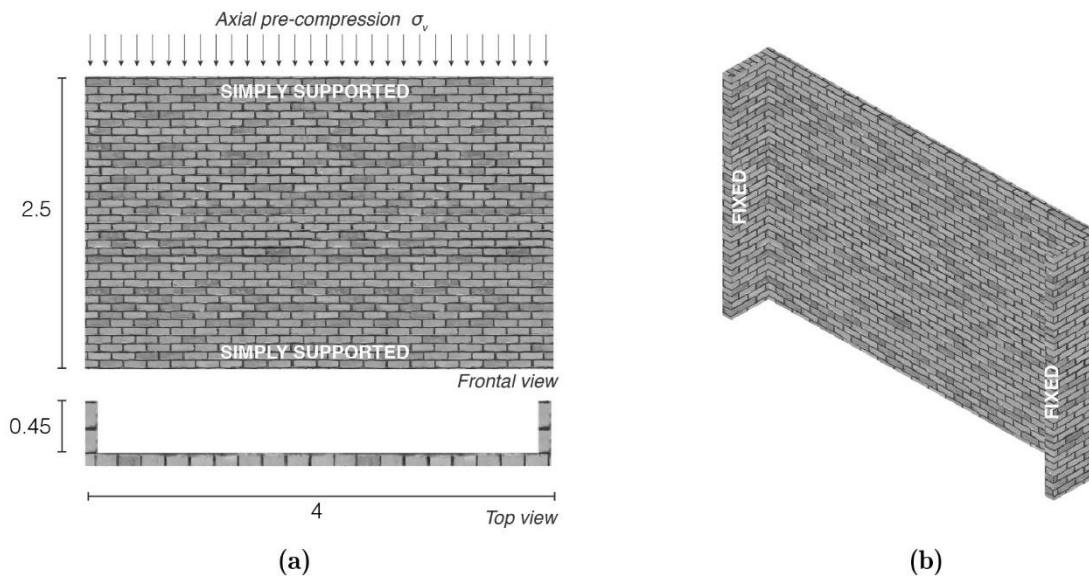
Out-of-plane loaded URM specimen: (a) frontal, top and (b) isometric views of the wall.
